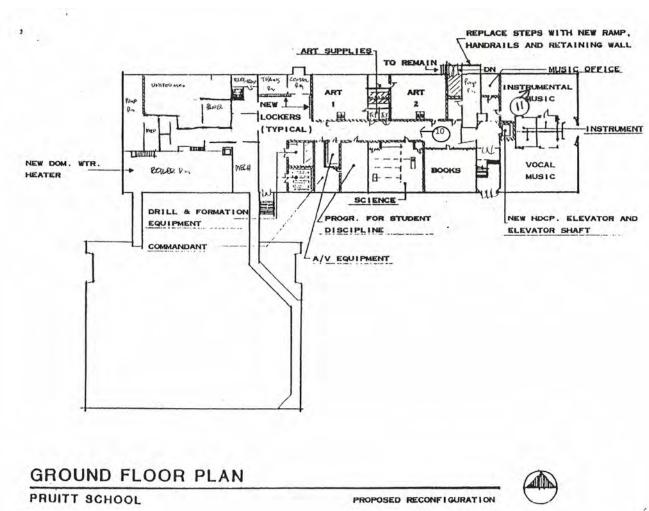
Ground floor plan and photo map (Plan courtesy of KIPP Inspire Academy).
